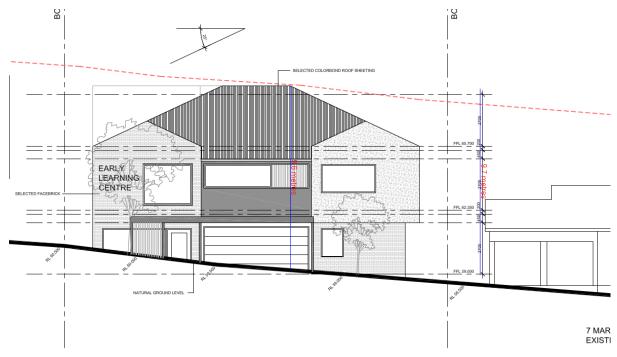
Streetscape (Mary Street) Elevation - Height. Source: Architectural plans prepared by Janssen Designs.
